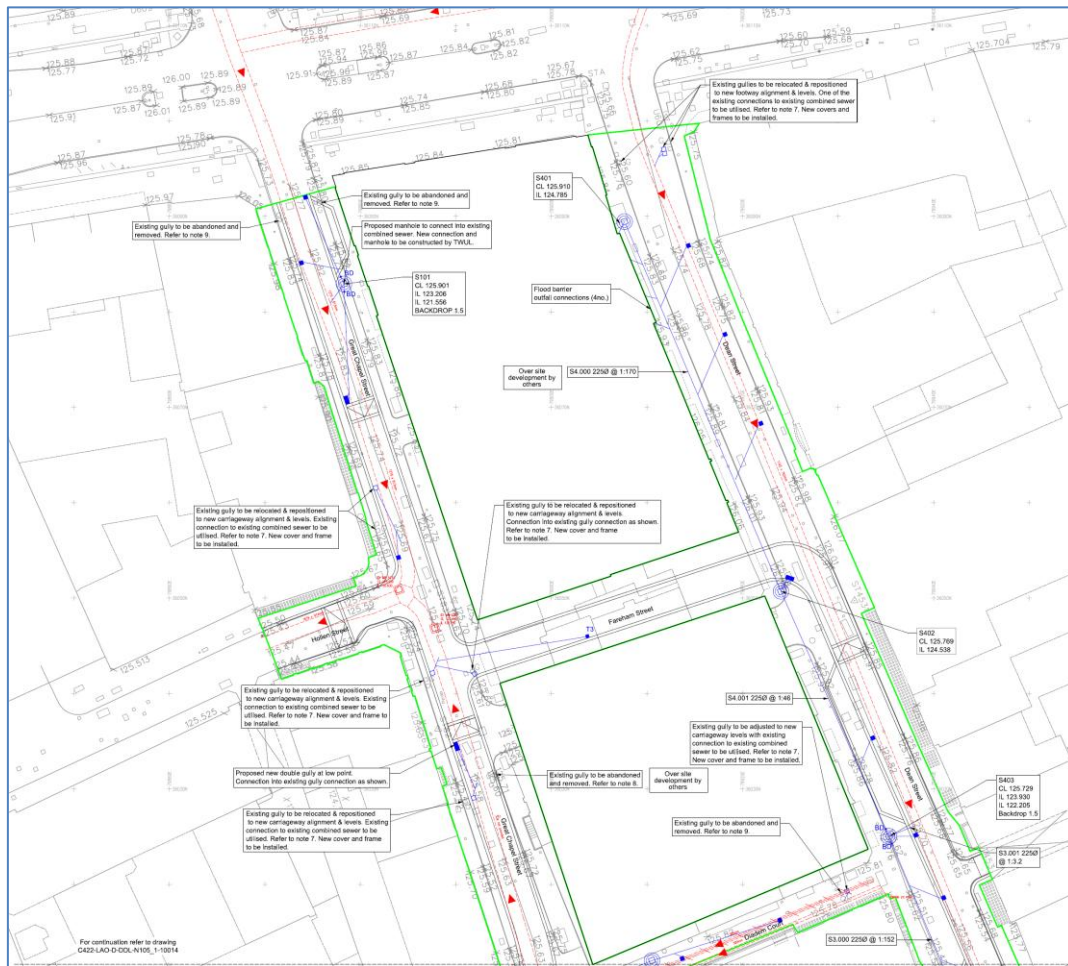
Drainage General Arrangement – Western Ticket Hall Northwest
